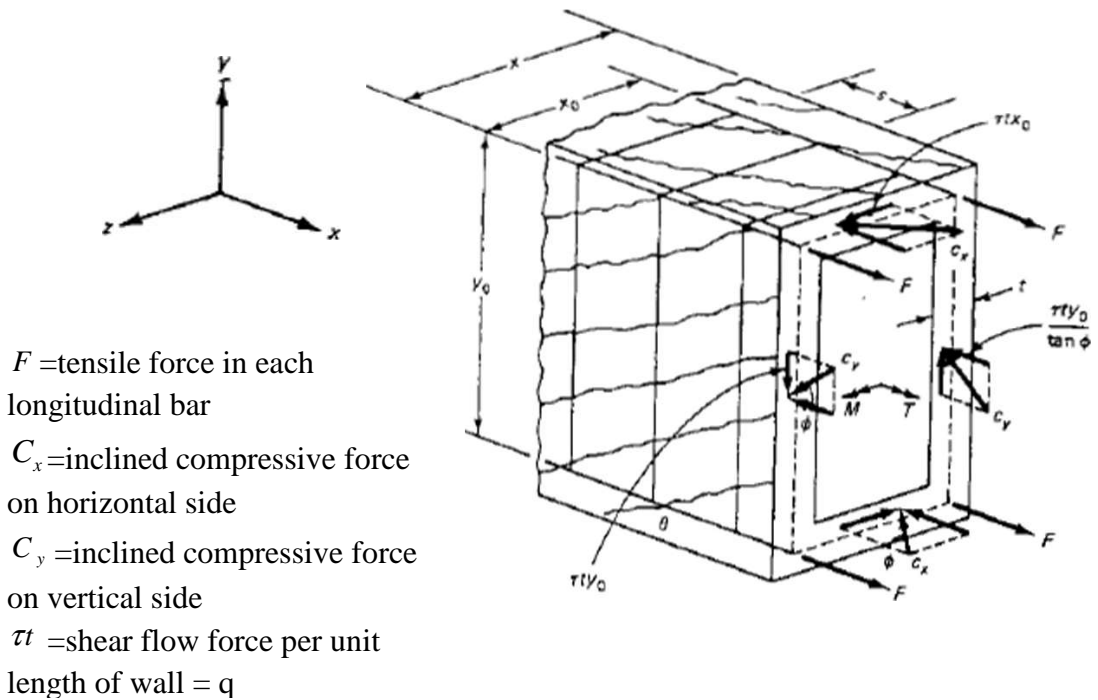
Forces on hollow box concrete surface by truss analogy (Nawy,2005).
